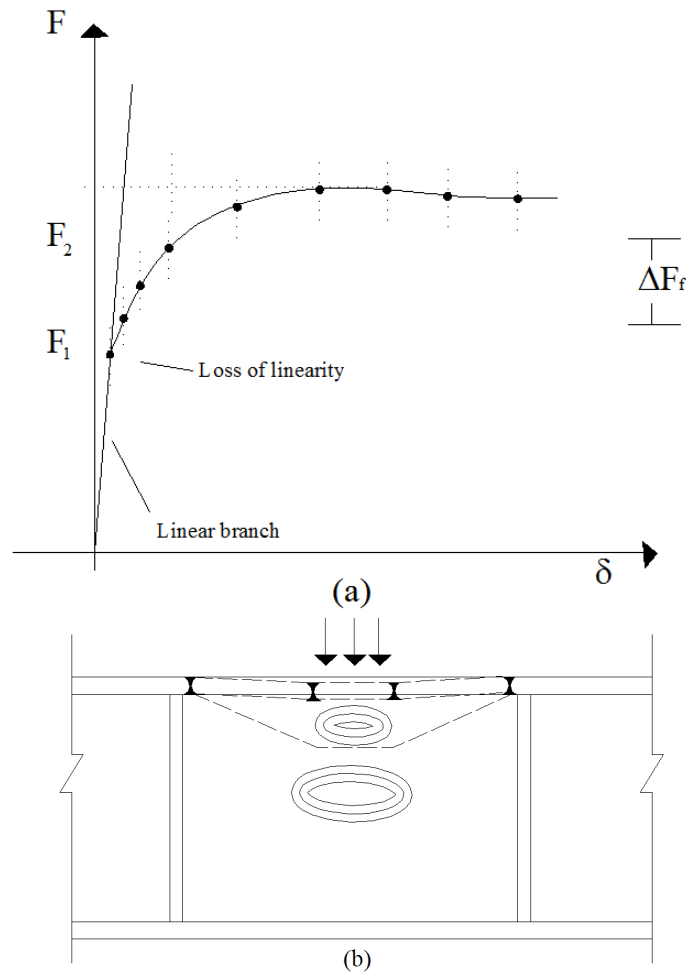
Structural response of girders subjected to patch loading when $l_y > a$
